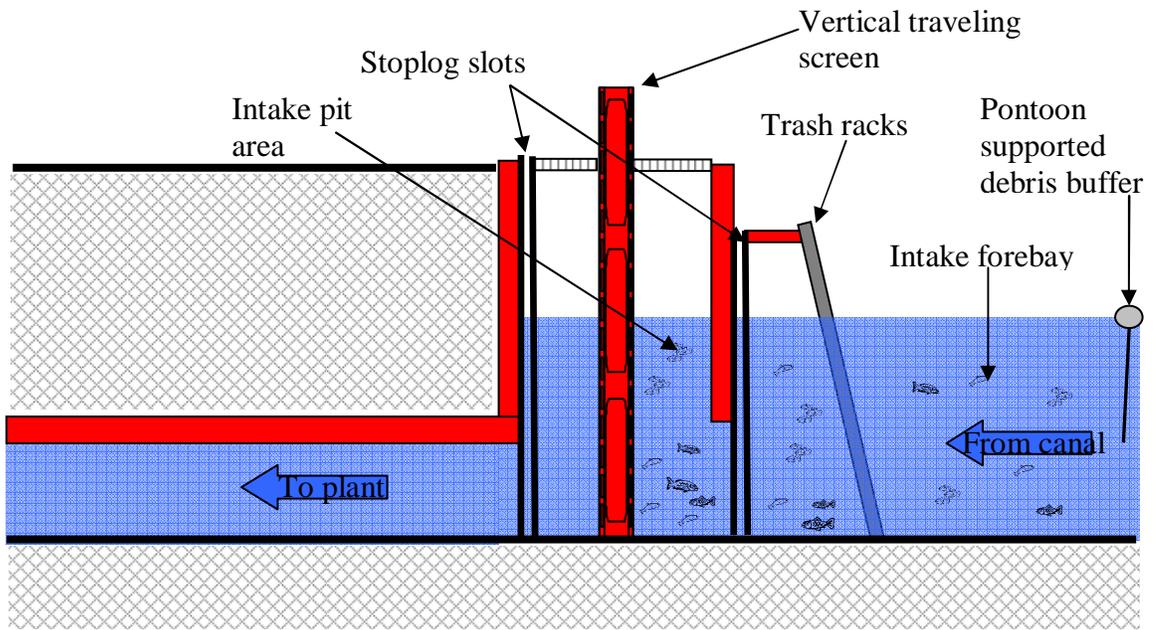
General schematic of the cooling water intake structures (CWISs) at Plant Barry.
